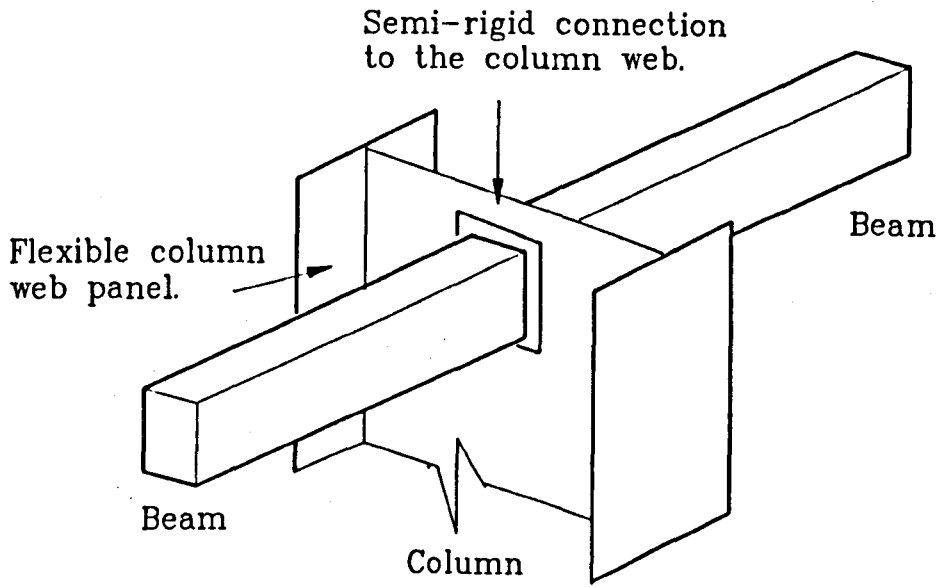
Small beams connected to a flexible web panel via stiff connections.
